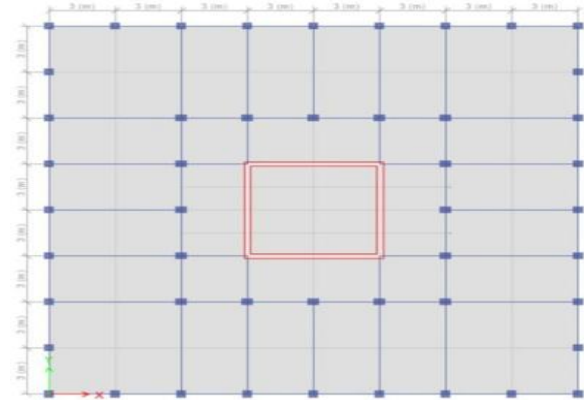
Typical Floor Plan of the 20-Storey Tube-in-Tube Building (ETABS v19.0)
